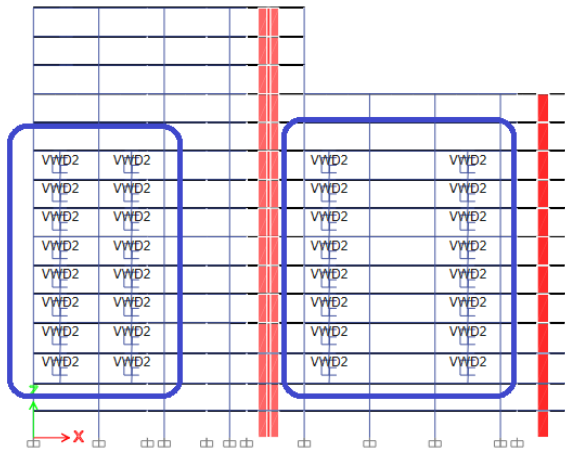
ETABS, typical elevation in X with dampers – VWD2
